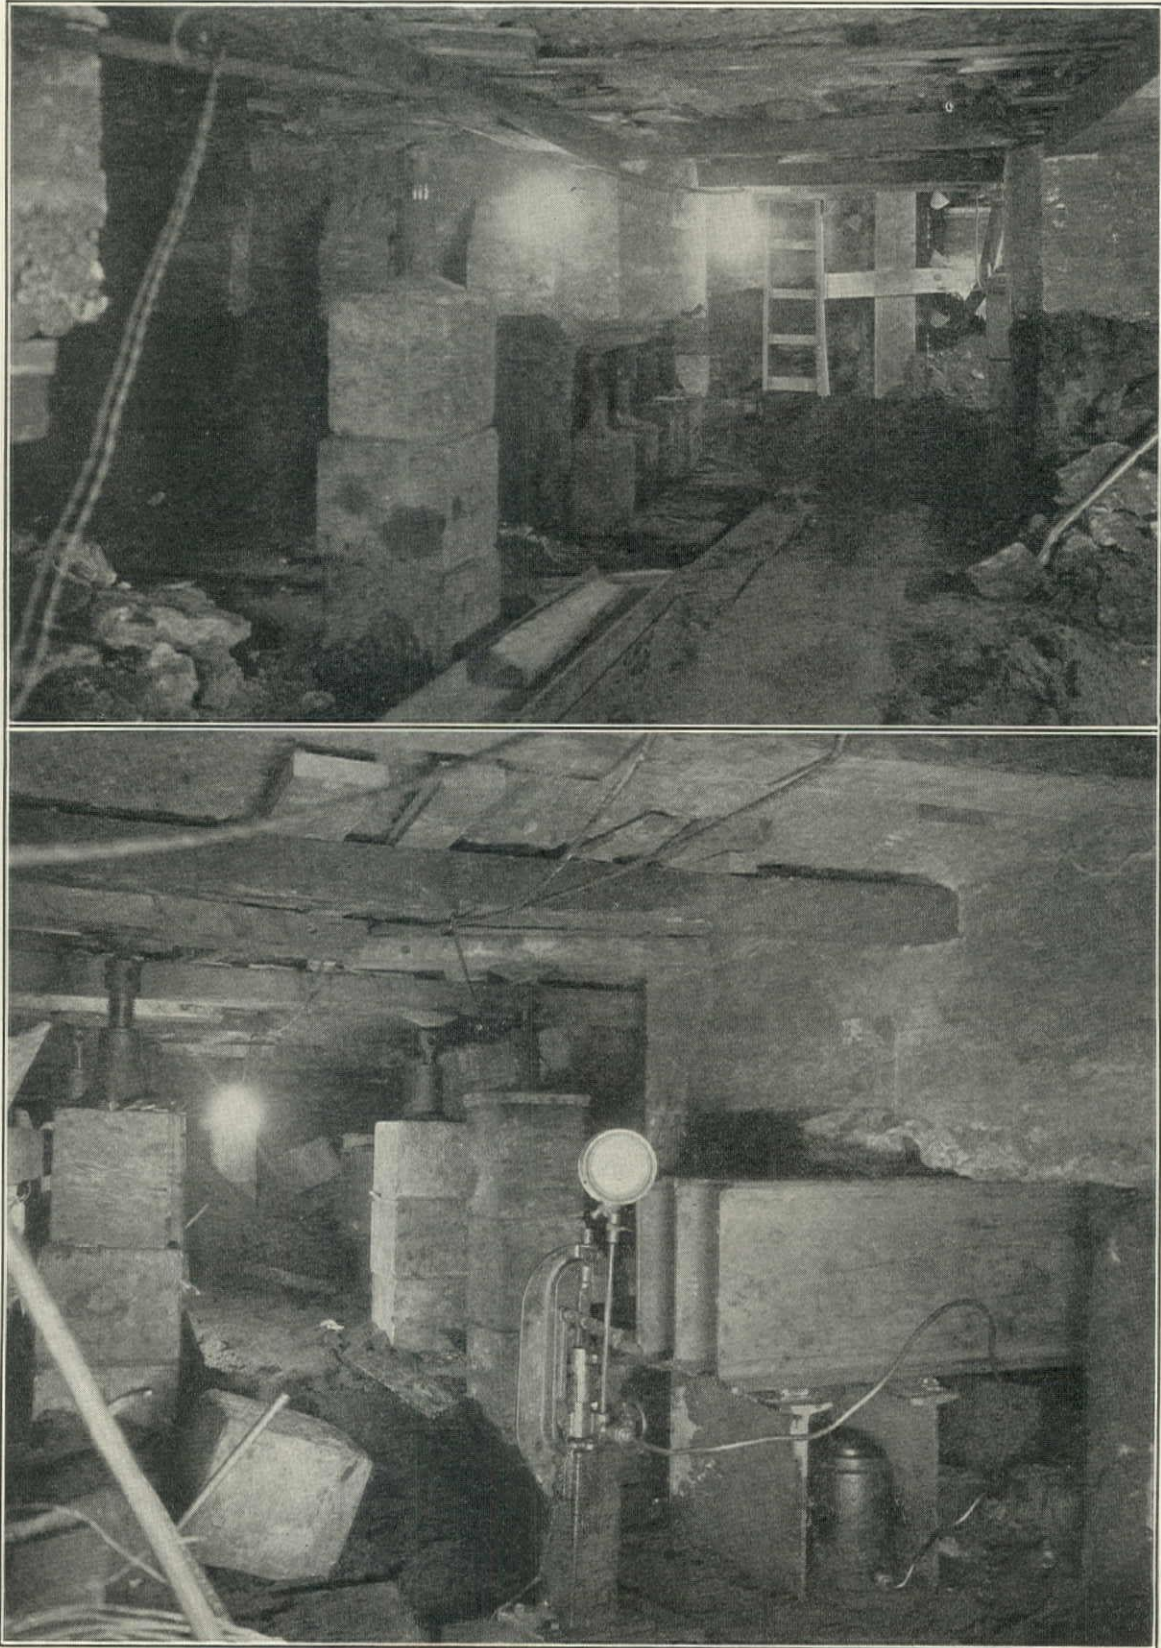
(UPPER) SHORING UNDER BASEMENT SLAB AND PILE CAP, SAND ELEVATOR IN BACKGROUND. (LOWER) ONE-HALF OF STEEL IN PLACE. HYDRAULIC JACK IN POSITION FOR APPLYING LOAD
